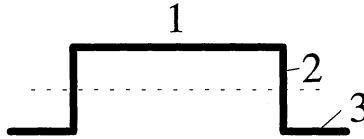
Hat Section and Definition of Cold-Formed Steel Elements
